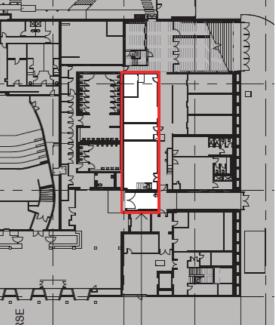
Current arrangement of Back-of-House stores and Bennelong Passage.
